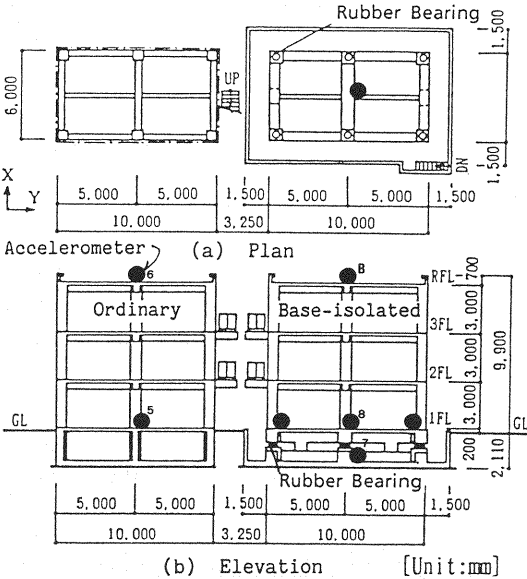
Plan and elevation of test buildings at Tohoku Univ.
